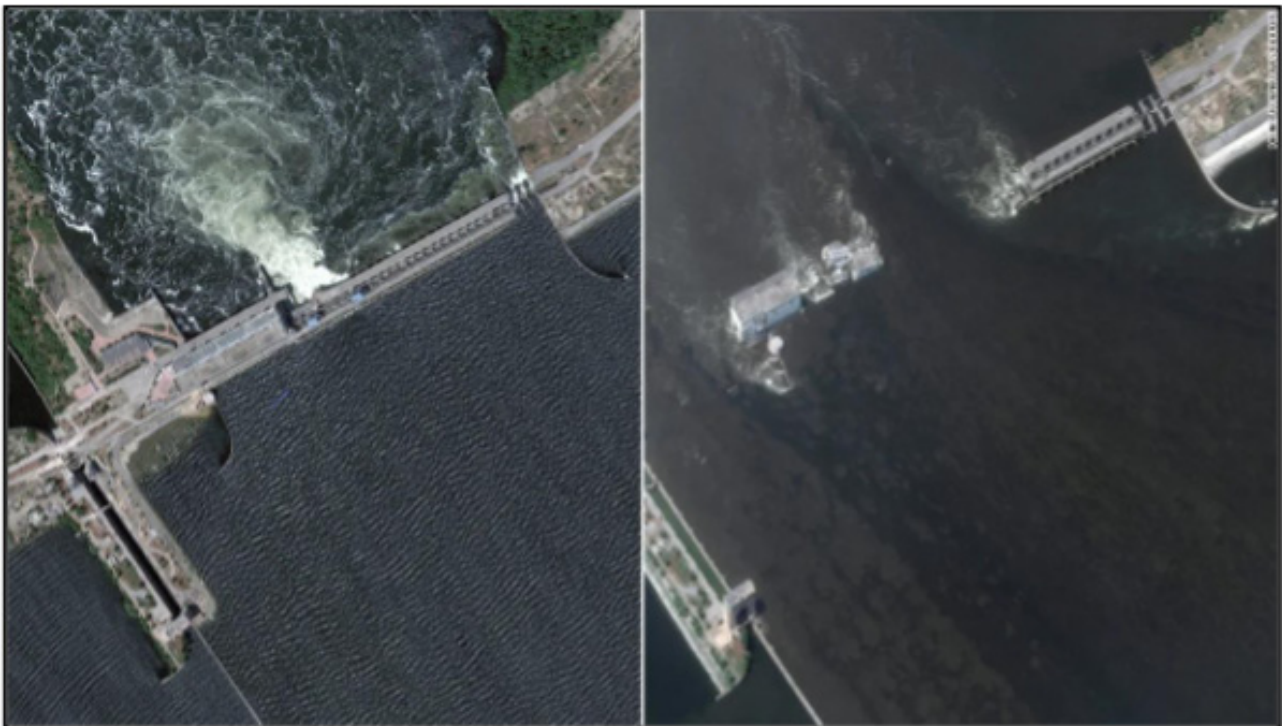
Image showing Kakhovka Dam on 5 Jun (left) before damage, and on 7 Jun (right) post damage.
